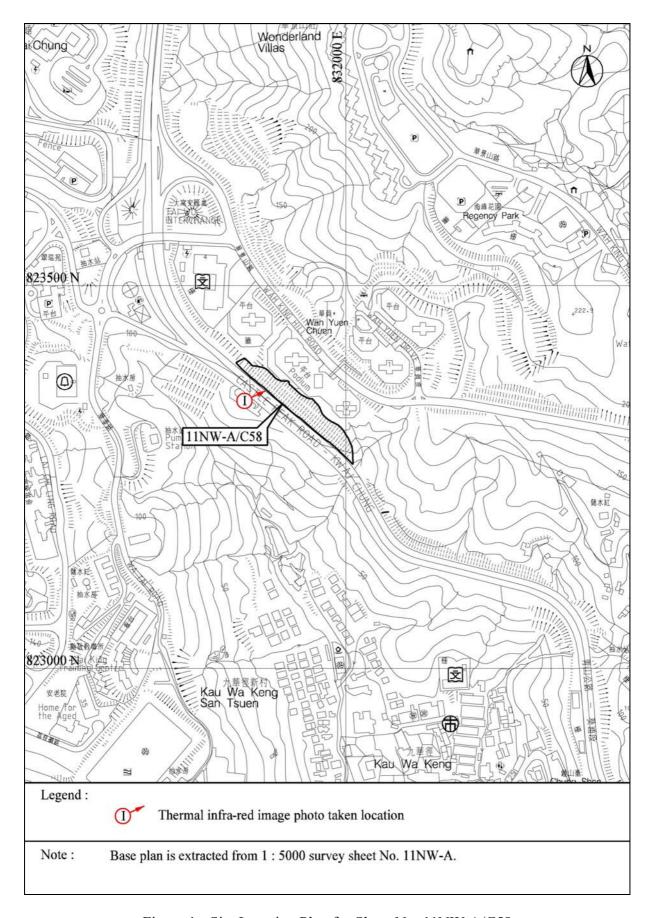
Site Location Plan for Slope No. 11NW-A/C58
